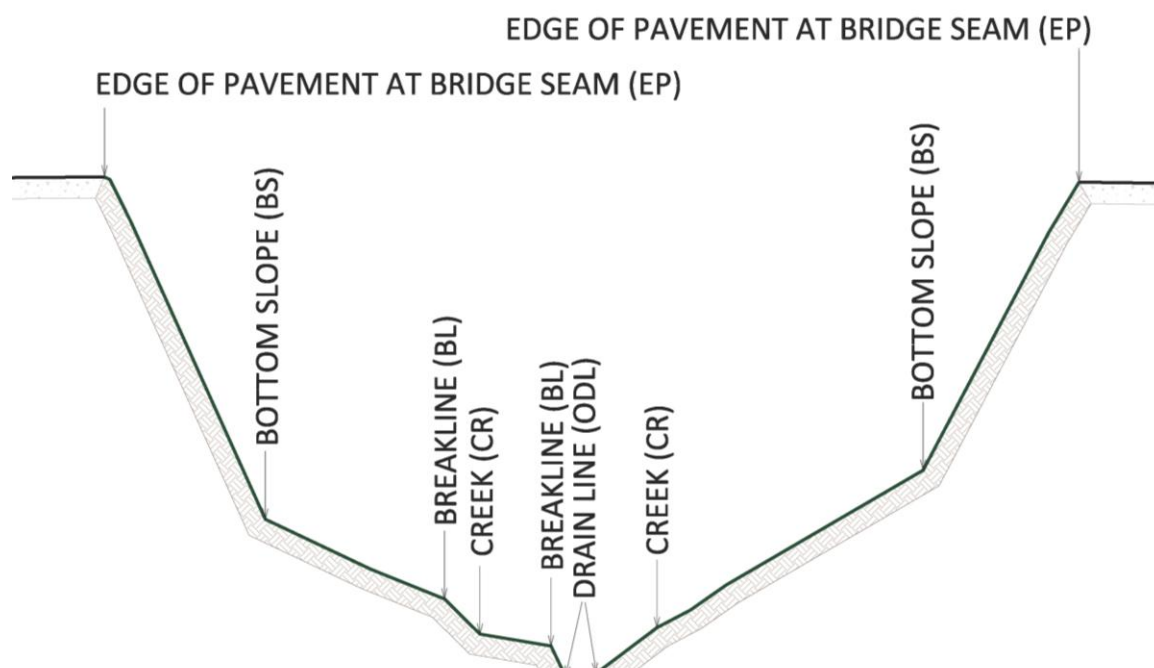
BRIDGE DTM SURVEY – CROSS SECTION VIEW
